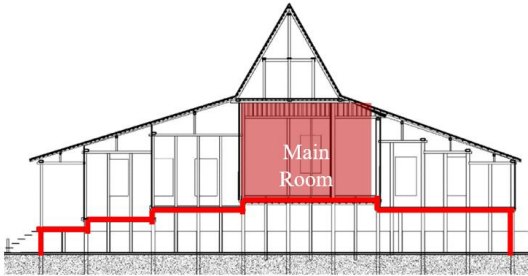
Levels of elevations in Banjar house (Source: Suwignyo, 2021)
